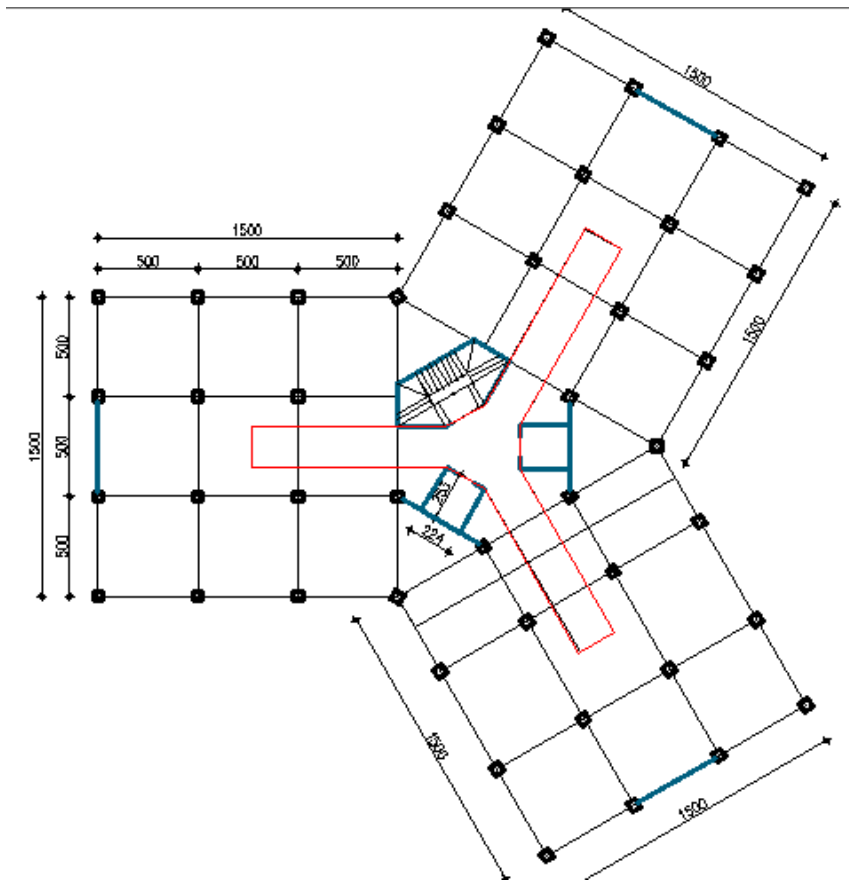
Three corner structure oriented with 120 degrees with section 3x15x15 m and with columns axis every 5 m with hexagonal concrete core wall in the centre of the building and perforated walls with dimension 5 m located to the side facades (source: the author)
